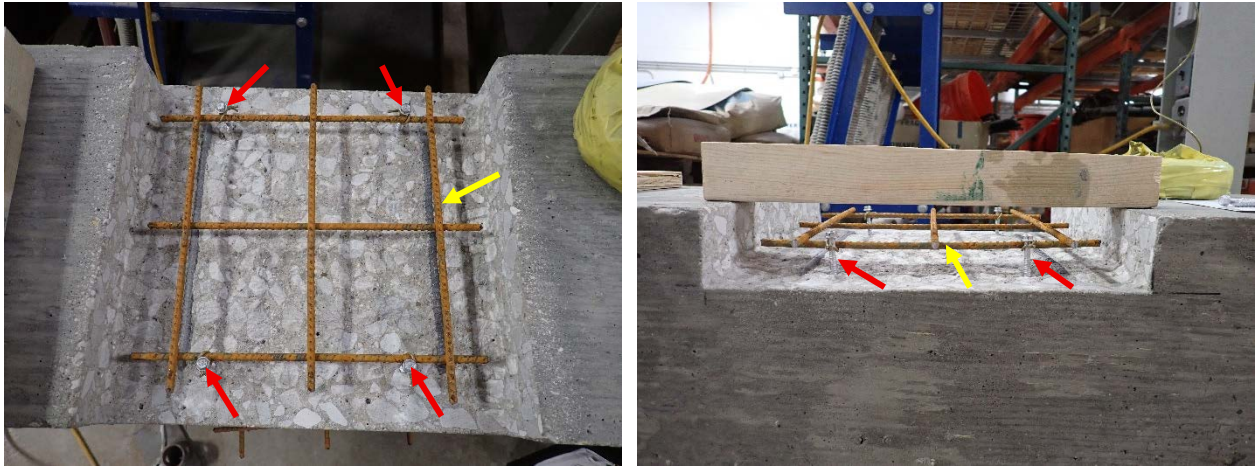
Anchorage by screw anchors (red arrows) and WWR (yellow arrows) in 1-1/2-inch and 2-inch cavities
